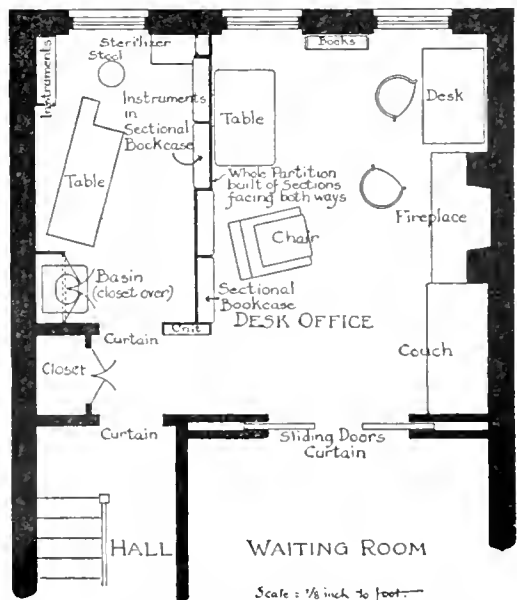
The usual 20-foot house with simplest form of division of offices. The partition is built of bookcase units, one-half facing each way. A one-patient office, since one can overhear in the examining room all that goes on in the desk office. A toilet is suggested.
